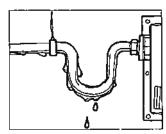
Provide drip loops where cable enters a fitting horizontally.
